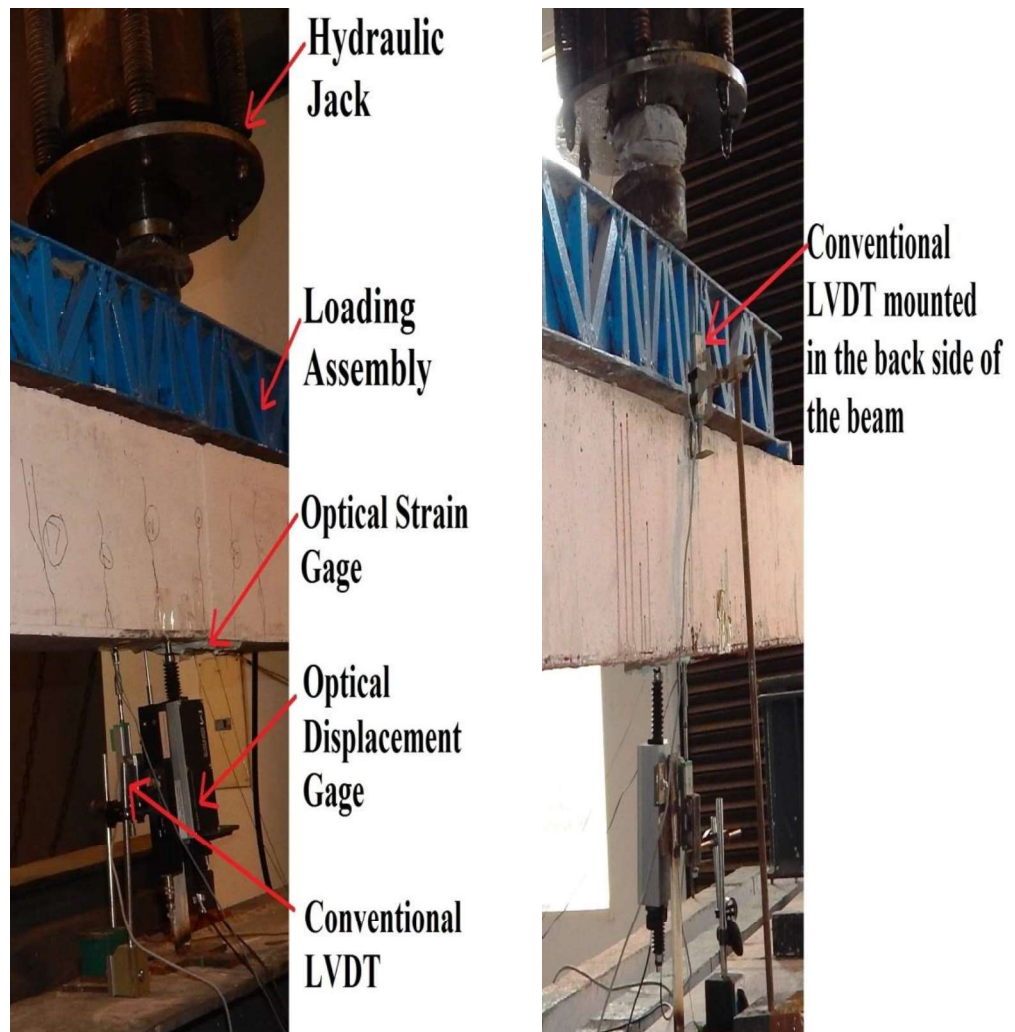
10 Mounting arrangement of optical strain gage and conventional LVDT on the beam.
